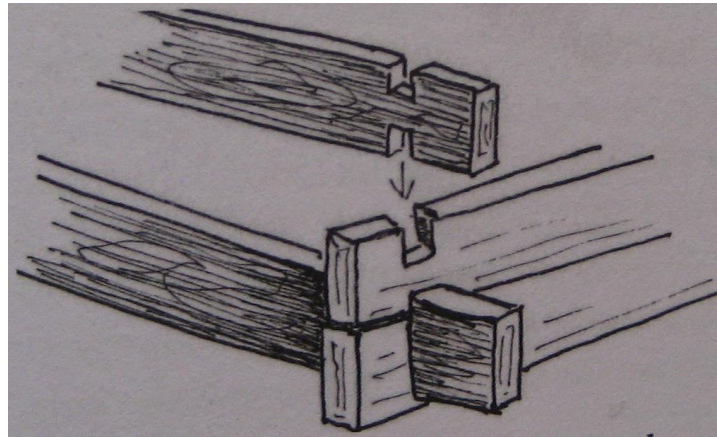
, Application Process of Tongue and Groove Joint Interlocking Construction Technique (Tuna, 2008)
